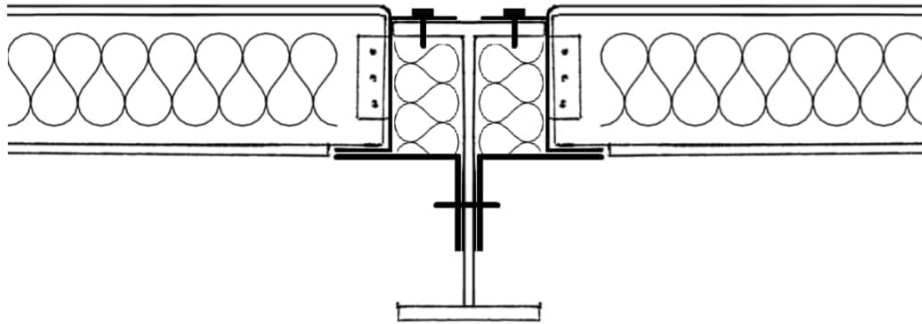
Use of pre-fabricated insulated suspended roof or floor cassette [5]
